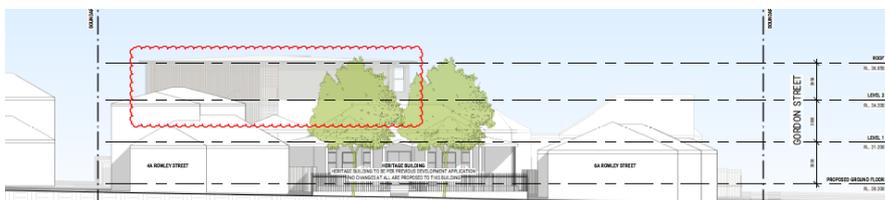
Rowley Street elevation (north), the modified scope is clouded in red. (Source: Extract drawing DA301, Walsh Architects)
